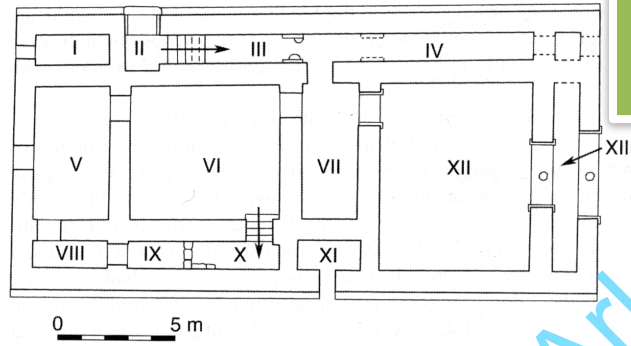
Plan of the House of the Tiles at Lerna, EH IIB. After M. H. Wienecke,
